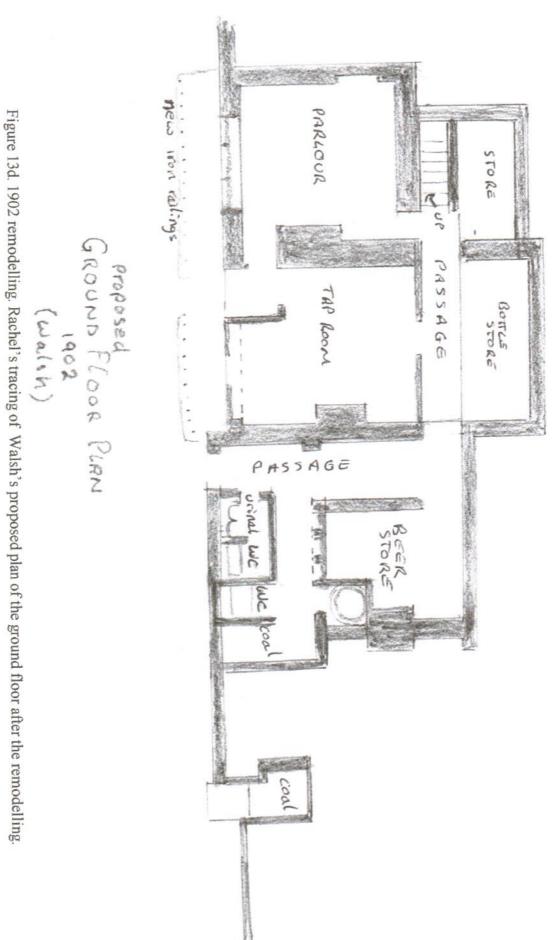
1902 remodelling. Rachel's tracing of Walsh's proposed plan of the ground floor after the remodelling.
